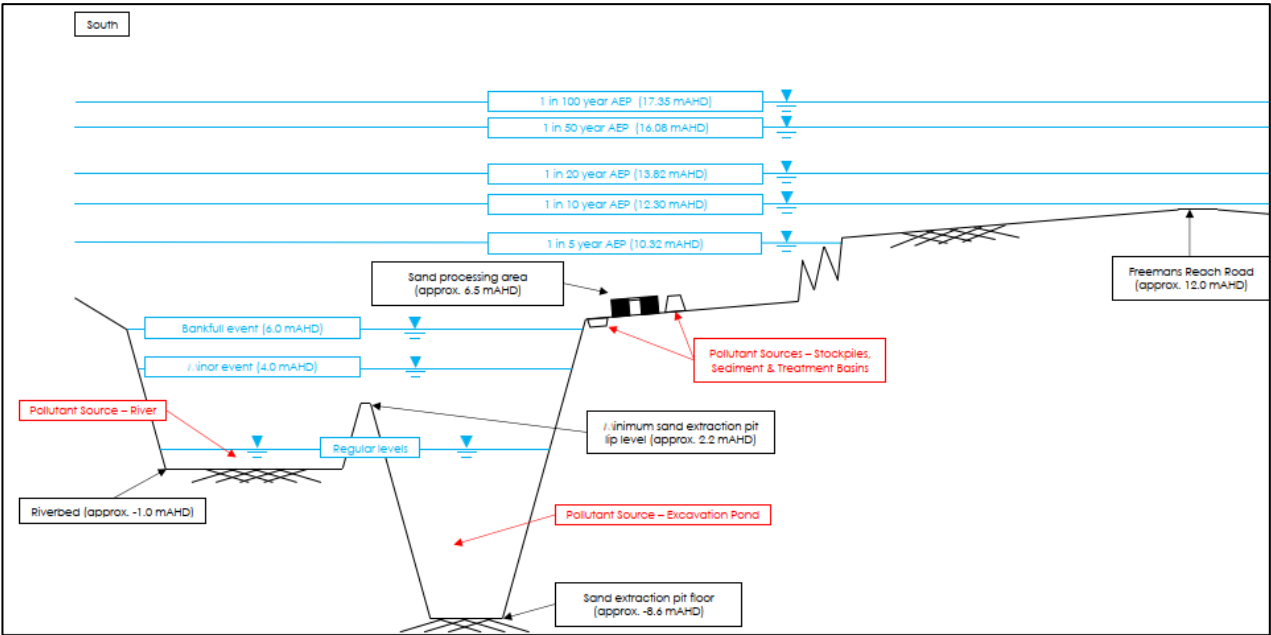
Extract from the indicative site flood level section (view looking upstream) (Source: Martens & Associates, 2020).
